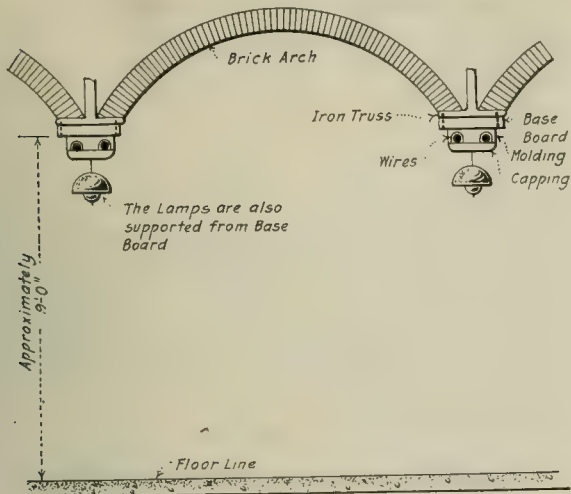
METHOD OF SUPPORTING WOOD MOLDING AND LAMPS ON THE IRONWORK OF A BRICK CEILING
